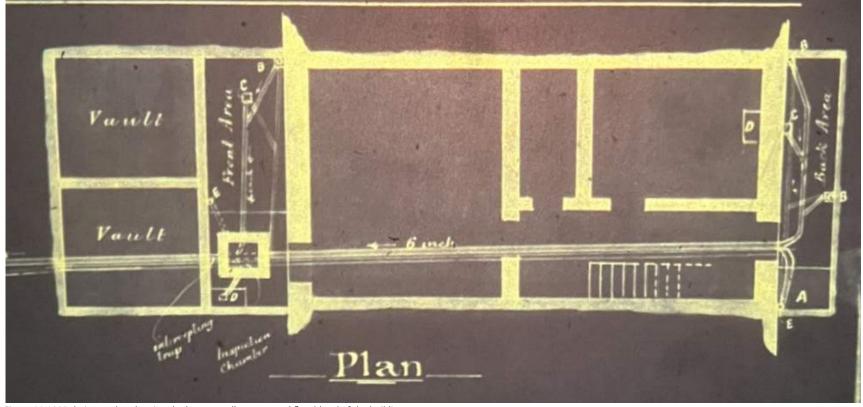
1892 drainage plan showing the basement (lower ground floor) level of the building.
